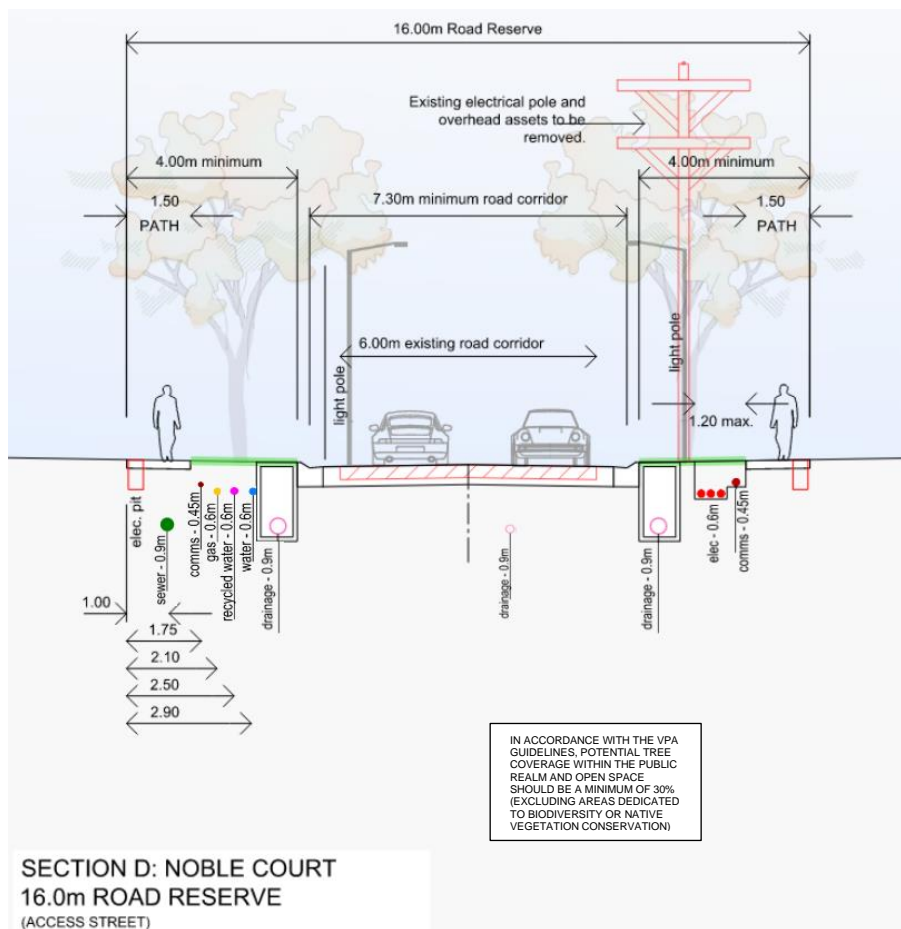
Typical Cross Section Access Street (with reserve on 1 side) - 16m
